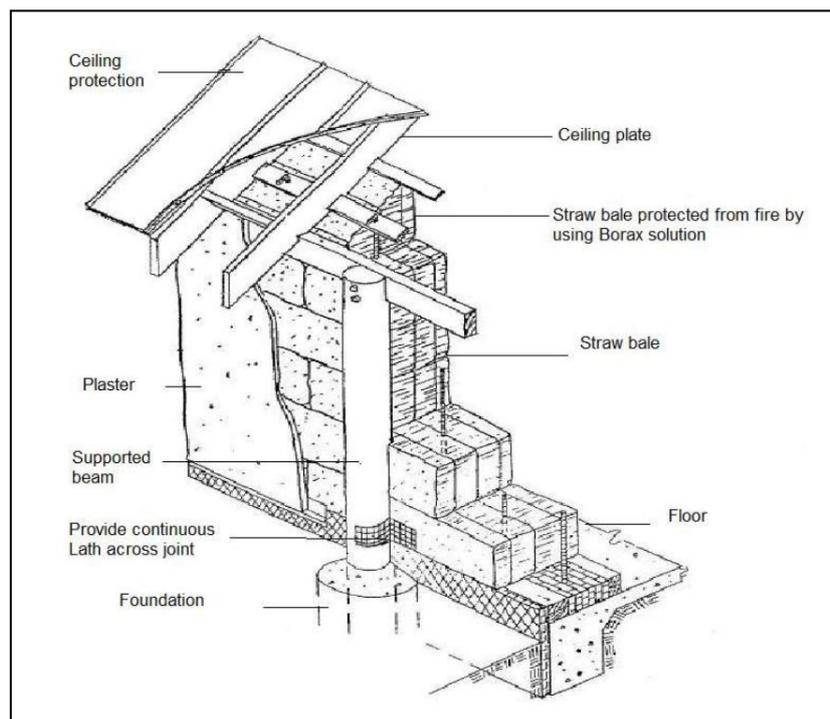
In-fill straw bale wall section with supports outside the wall [62].
